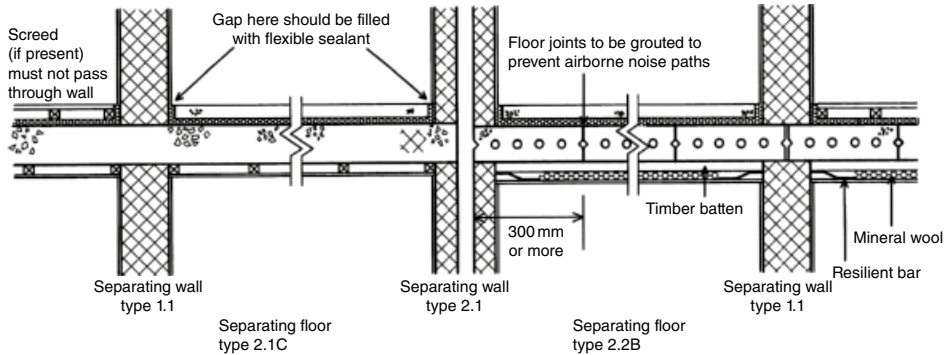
Details of functions between Type 2 separating floors and Type 1 and 2 separating walls.
